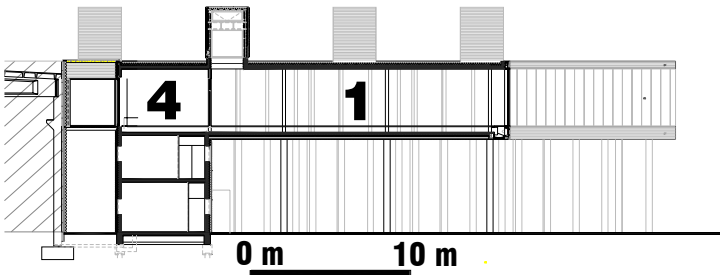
Vertical section through landscaped office (n°1) and internal conference rooms (n°4)
